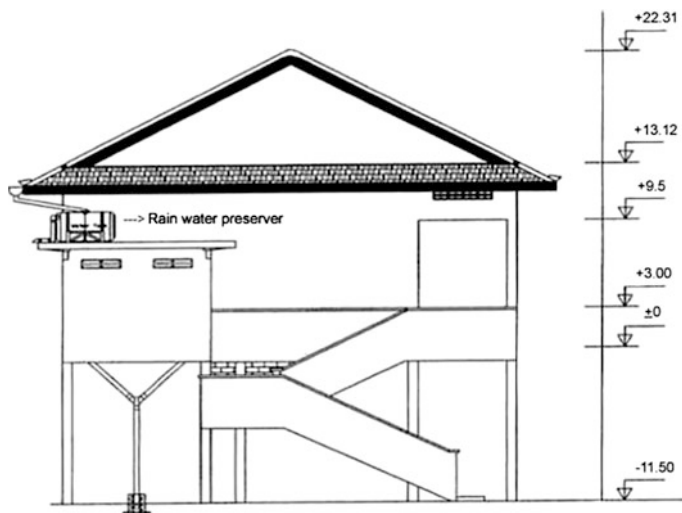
Cross-section of 11.50 ft elevated school building (Source ADPC, 2008)
